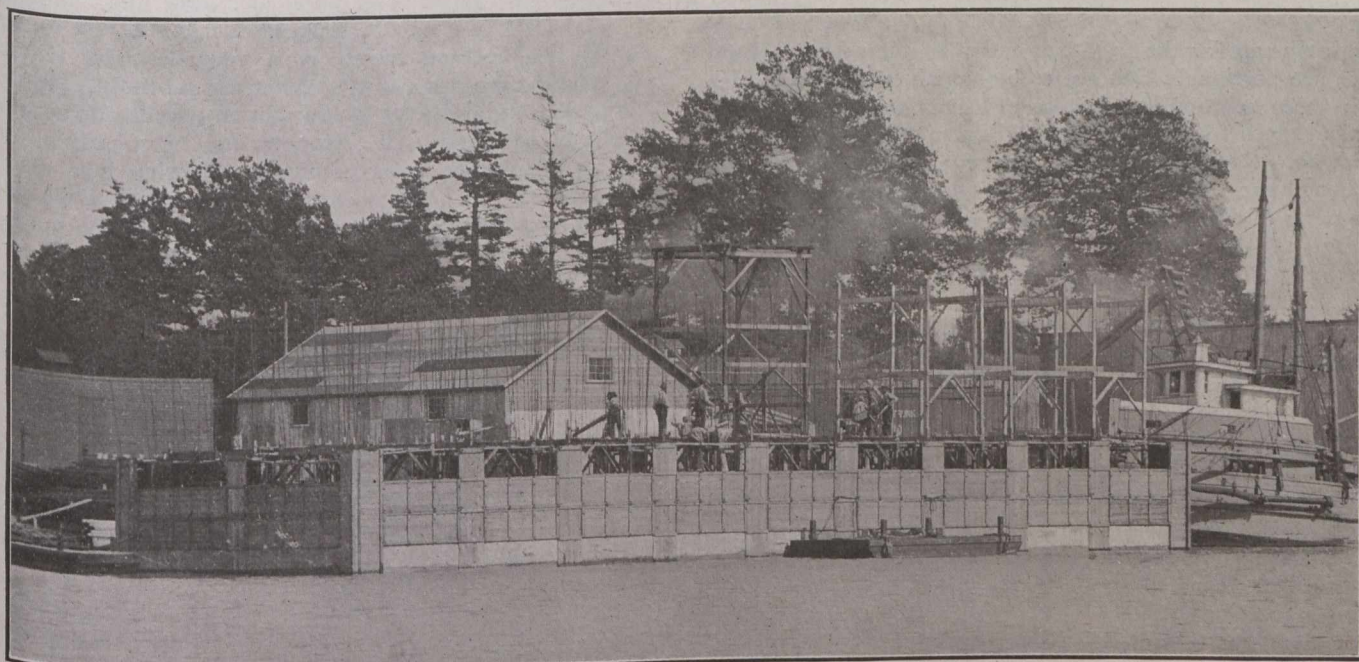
A Crib Under Construction—12 feet of concrete in place. Its weight has just sunk the supporting pontoon a few inches below the surface.
